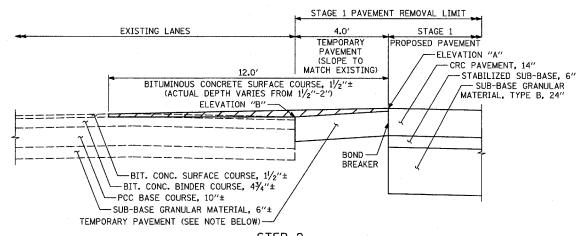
DETAIL OF MAINLINE TEMPORARY PAVEMENT FOR POST-STAGE 1 WINTER LANE CONFIGURATION
